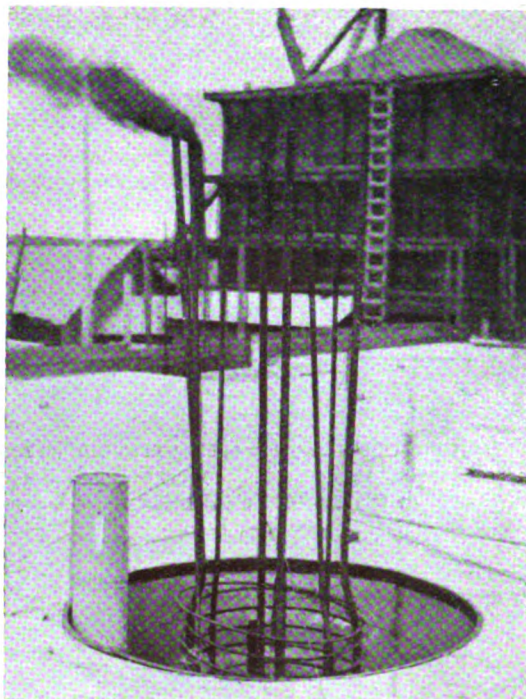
FORMS BEFORE PLACING CONCRETE.
